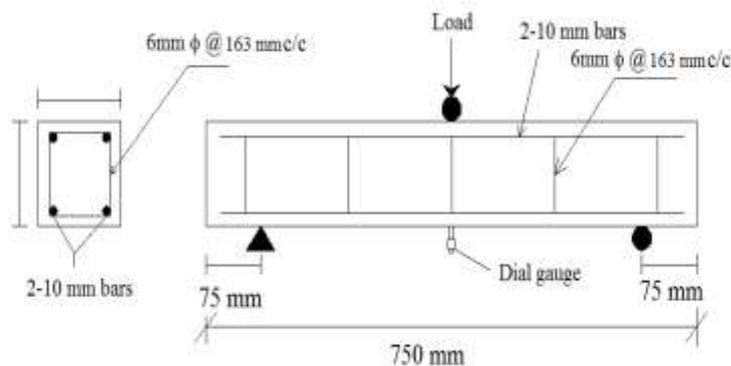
Schematic diagram of flexural test setup of RC beam with geometric and reinforcement details.
